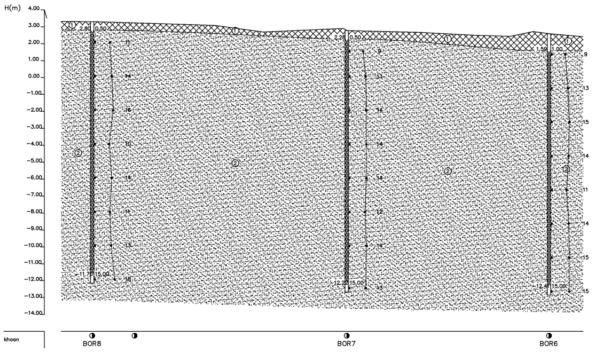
Longitudinal Section of Soil Survey at Japanese Bridge Canal
